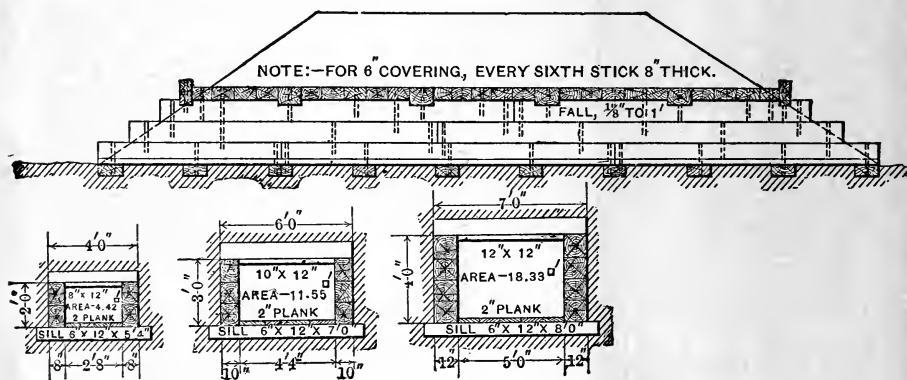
STANDARD TIMBER BOX CULVERT. C., M. & St. P. Ry. (Feb. 1889.)
